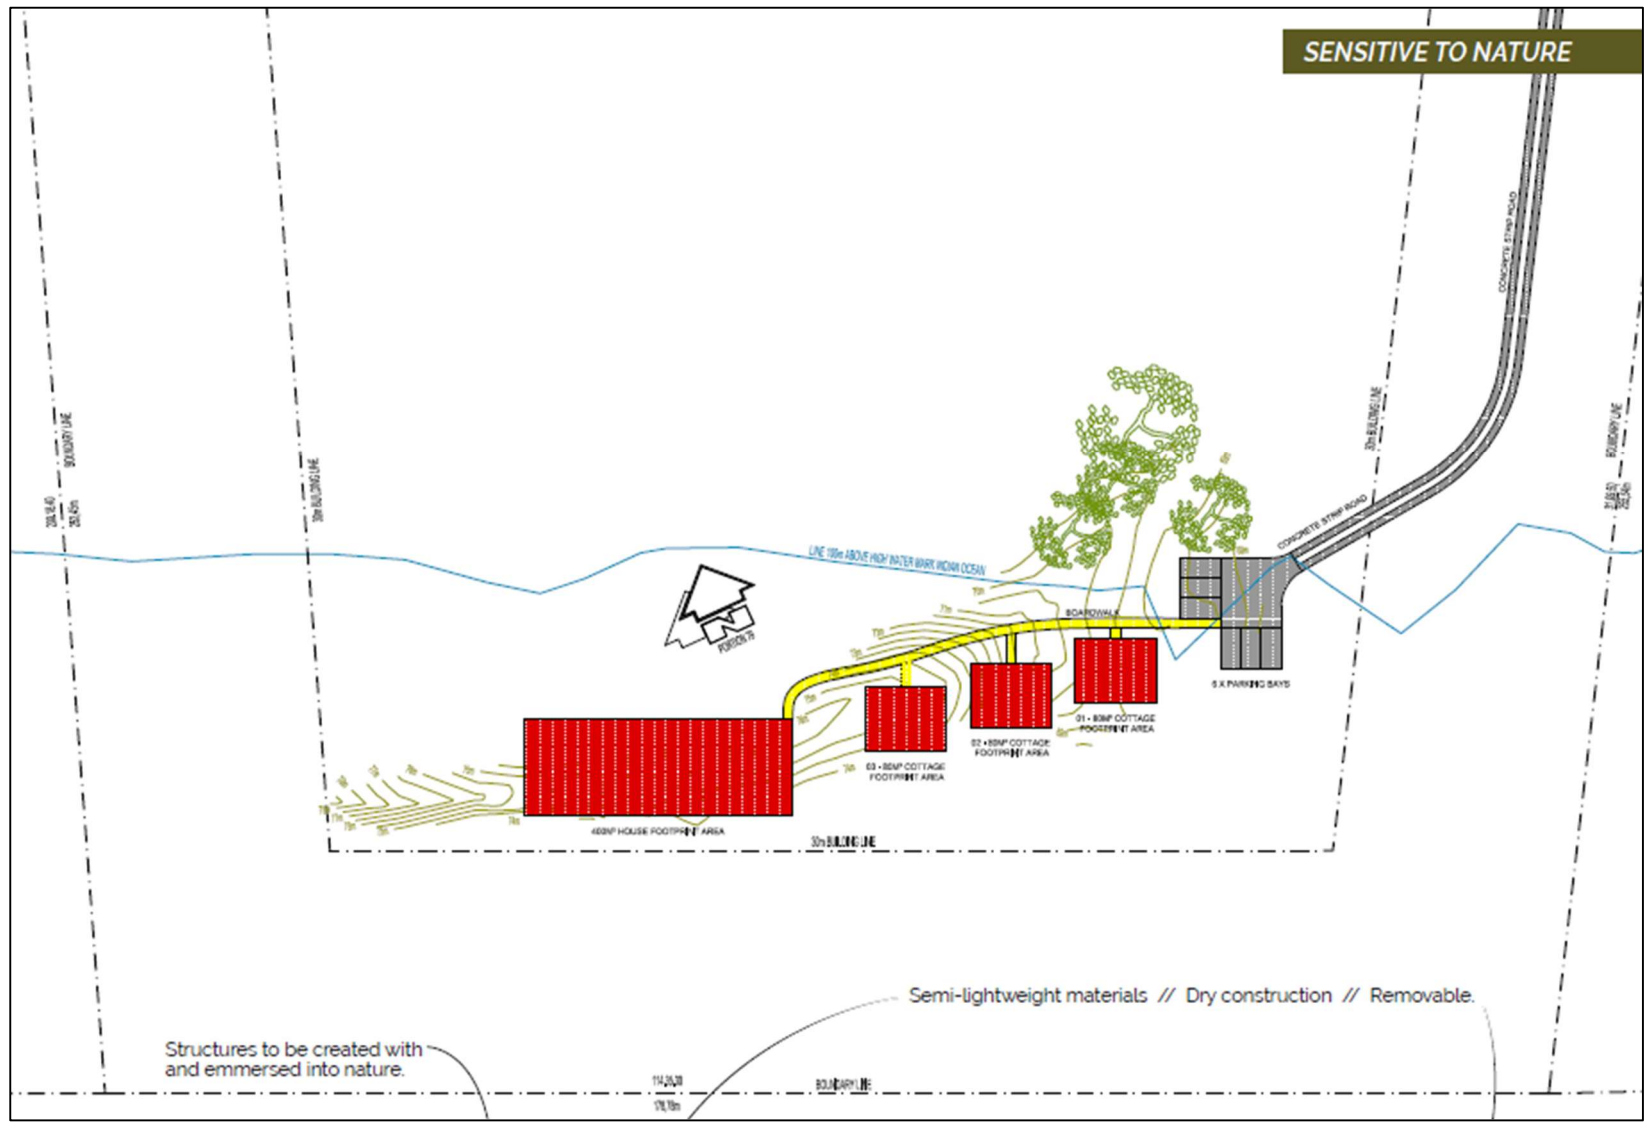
Zoomed view of Site Plan and concept design provided by Olivier Architects.
